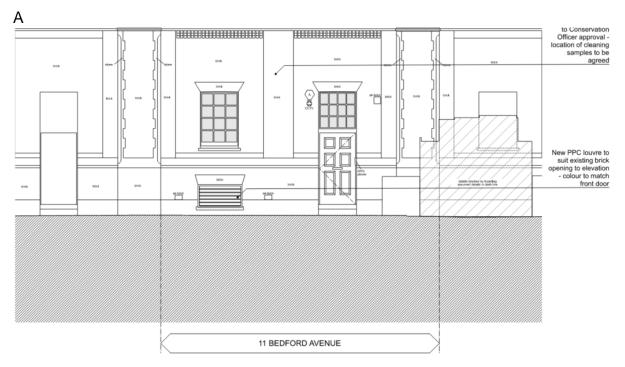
(above): As approved ventilation louvre at lower ground floor level on the mews building at 11 Bedford Avenue under planning permission ref 2019/3676/P dated 28/11/2019
